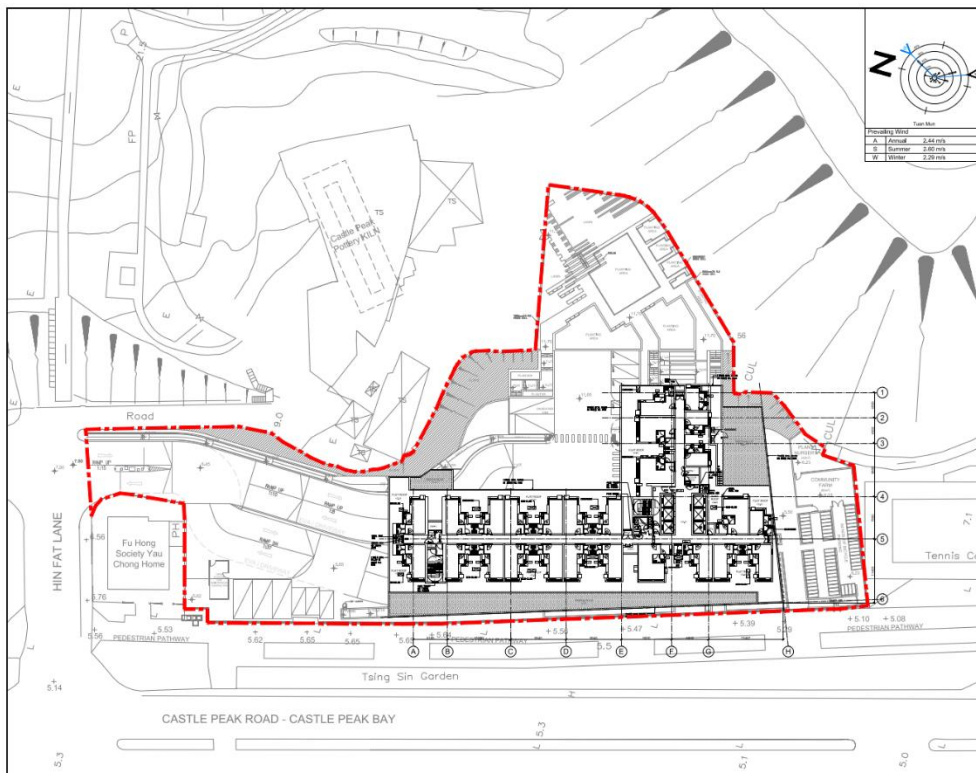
Indicative Plan of Proposed Scheme (Typical Floor)
